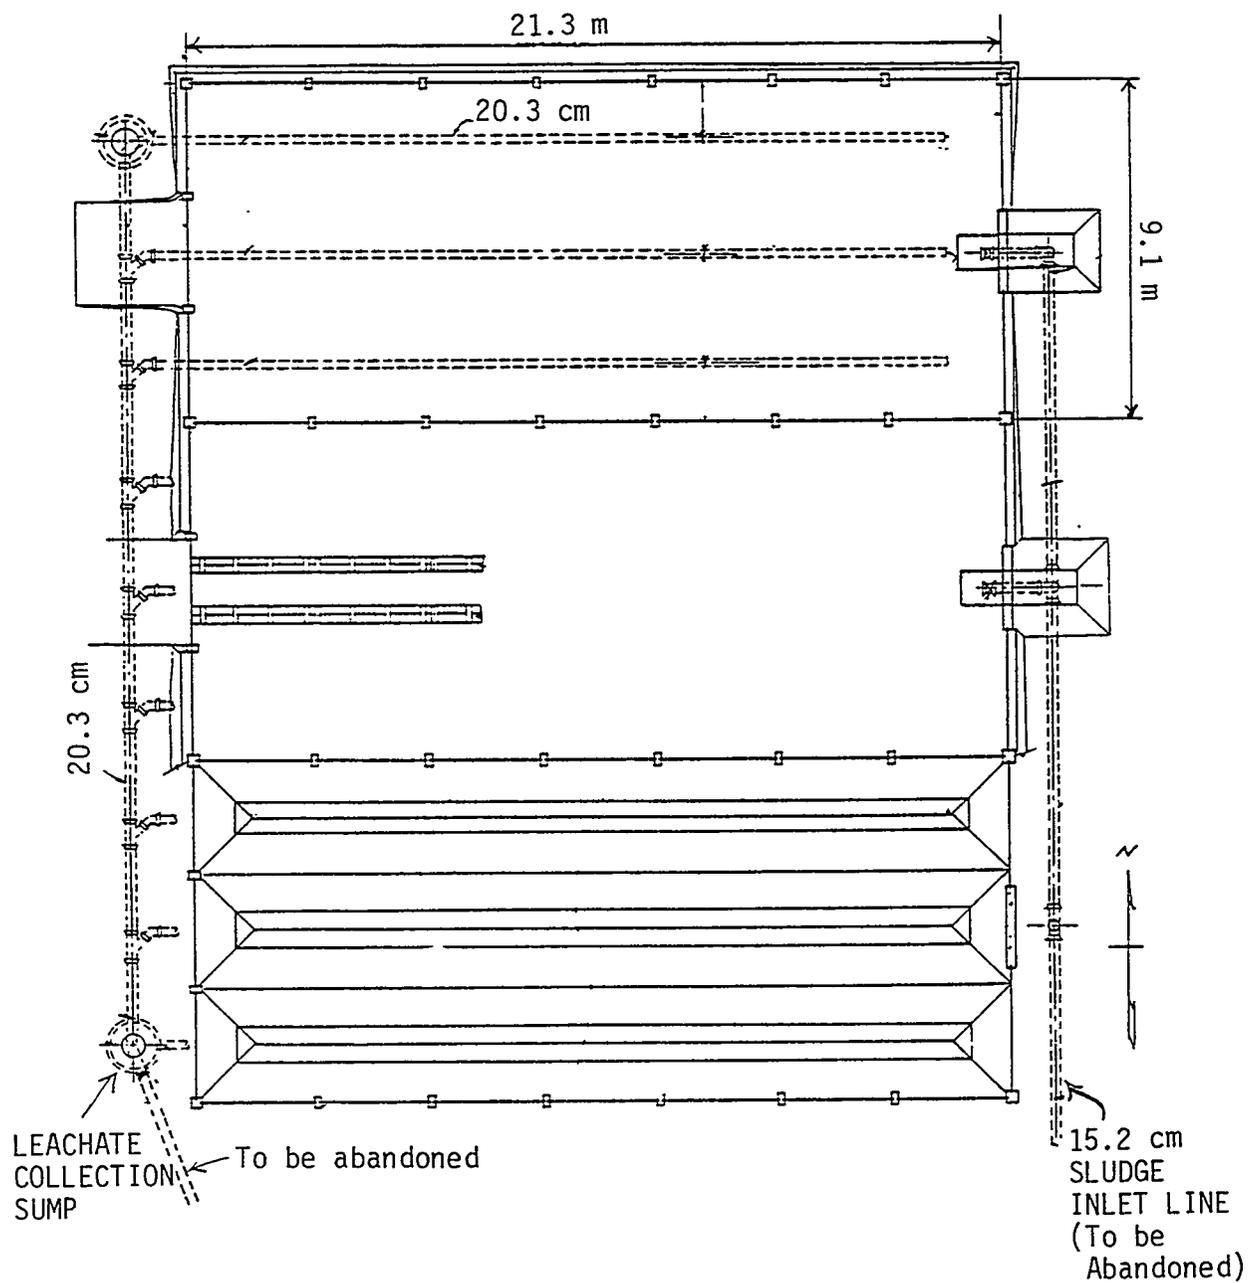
Modifications of the Underground Leachate Collection Piping at Existing X-615 Sewage Treatment Plant
